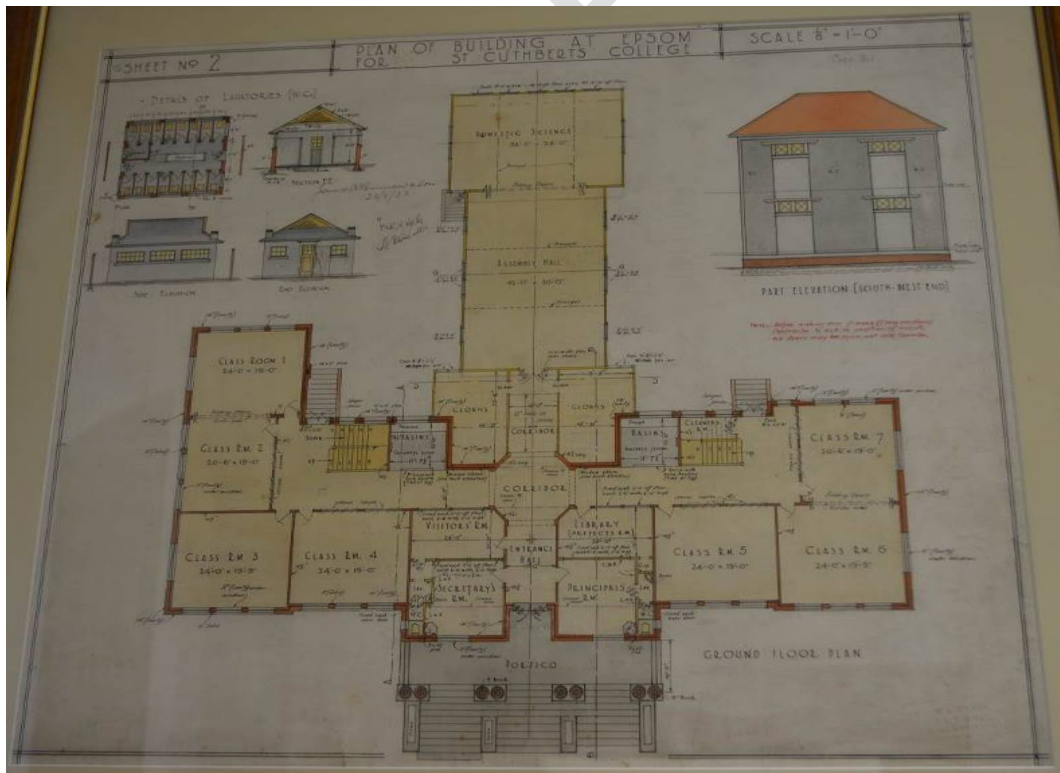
Robertson Building architectural plans by Holman and Moses, showing ground floor plan and elevations (photographed original, courtesy of St Cuthbert's College).
